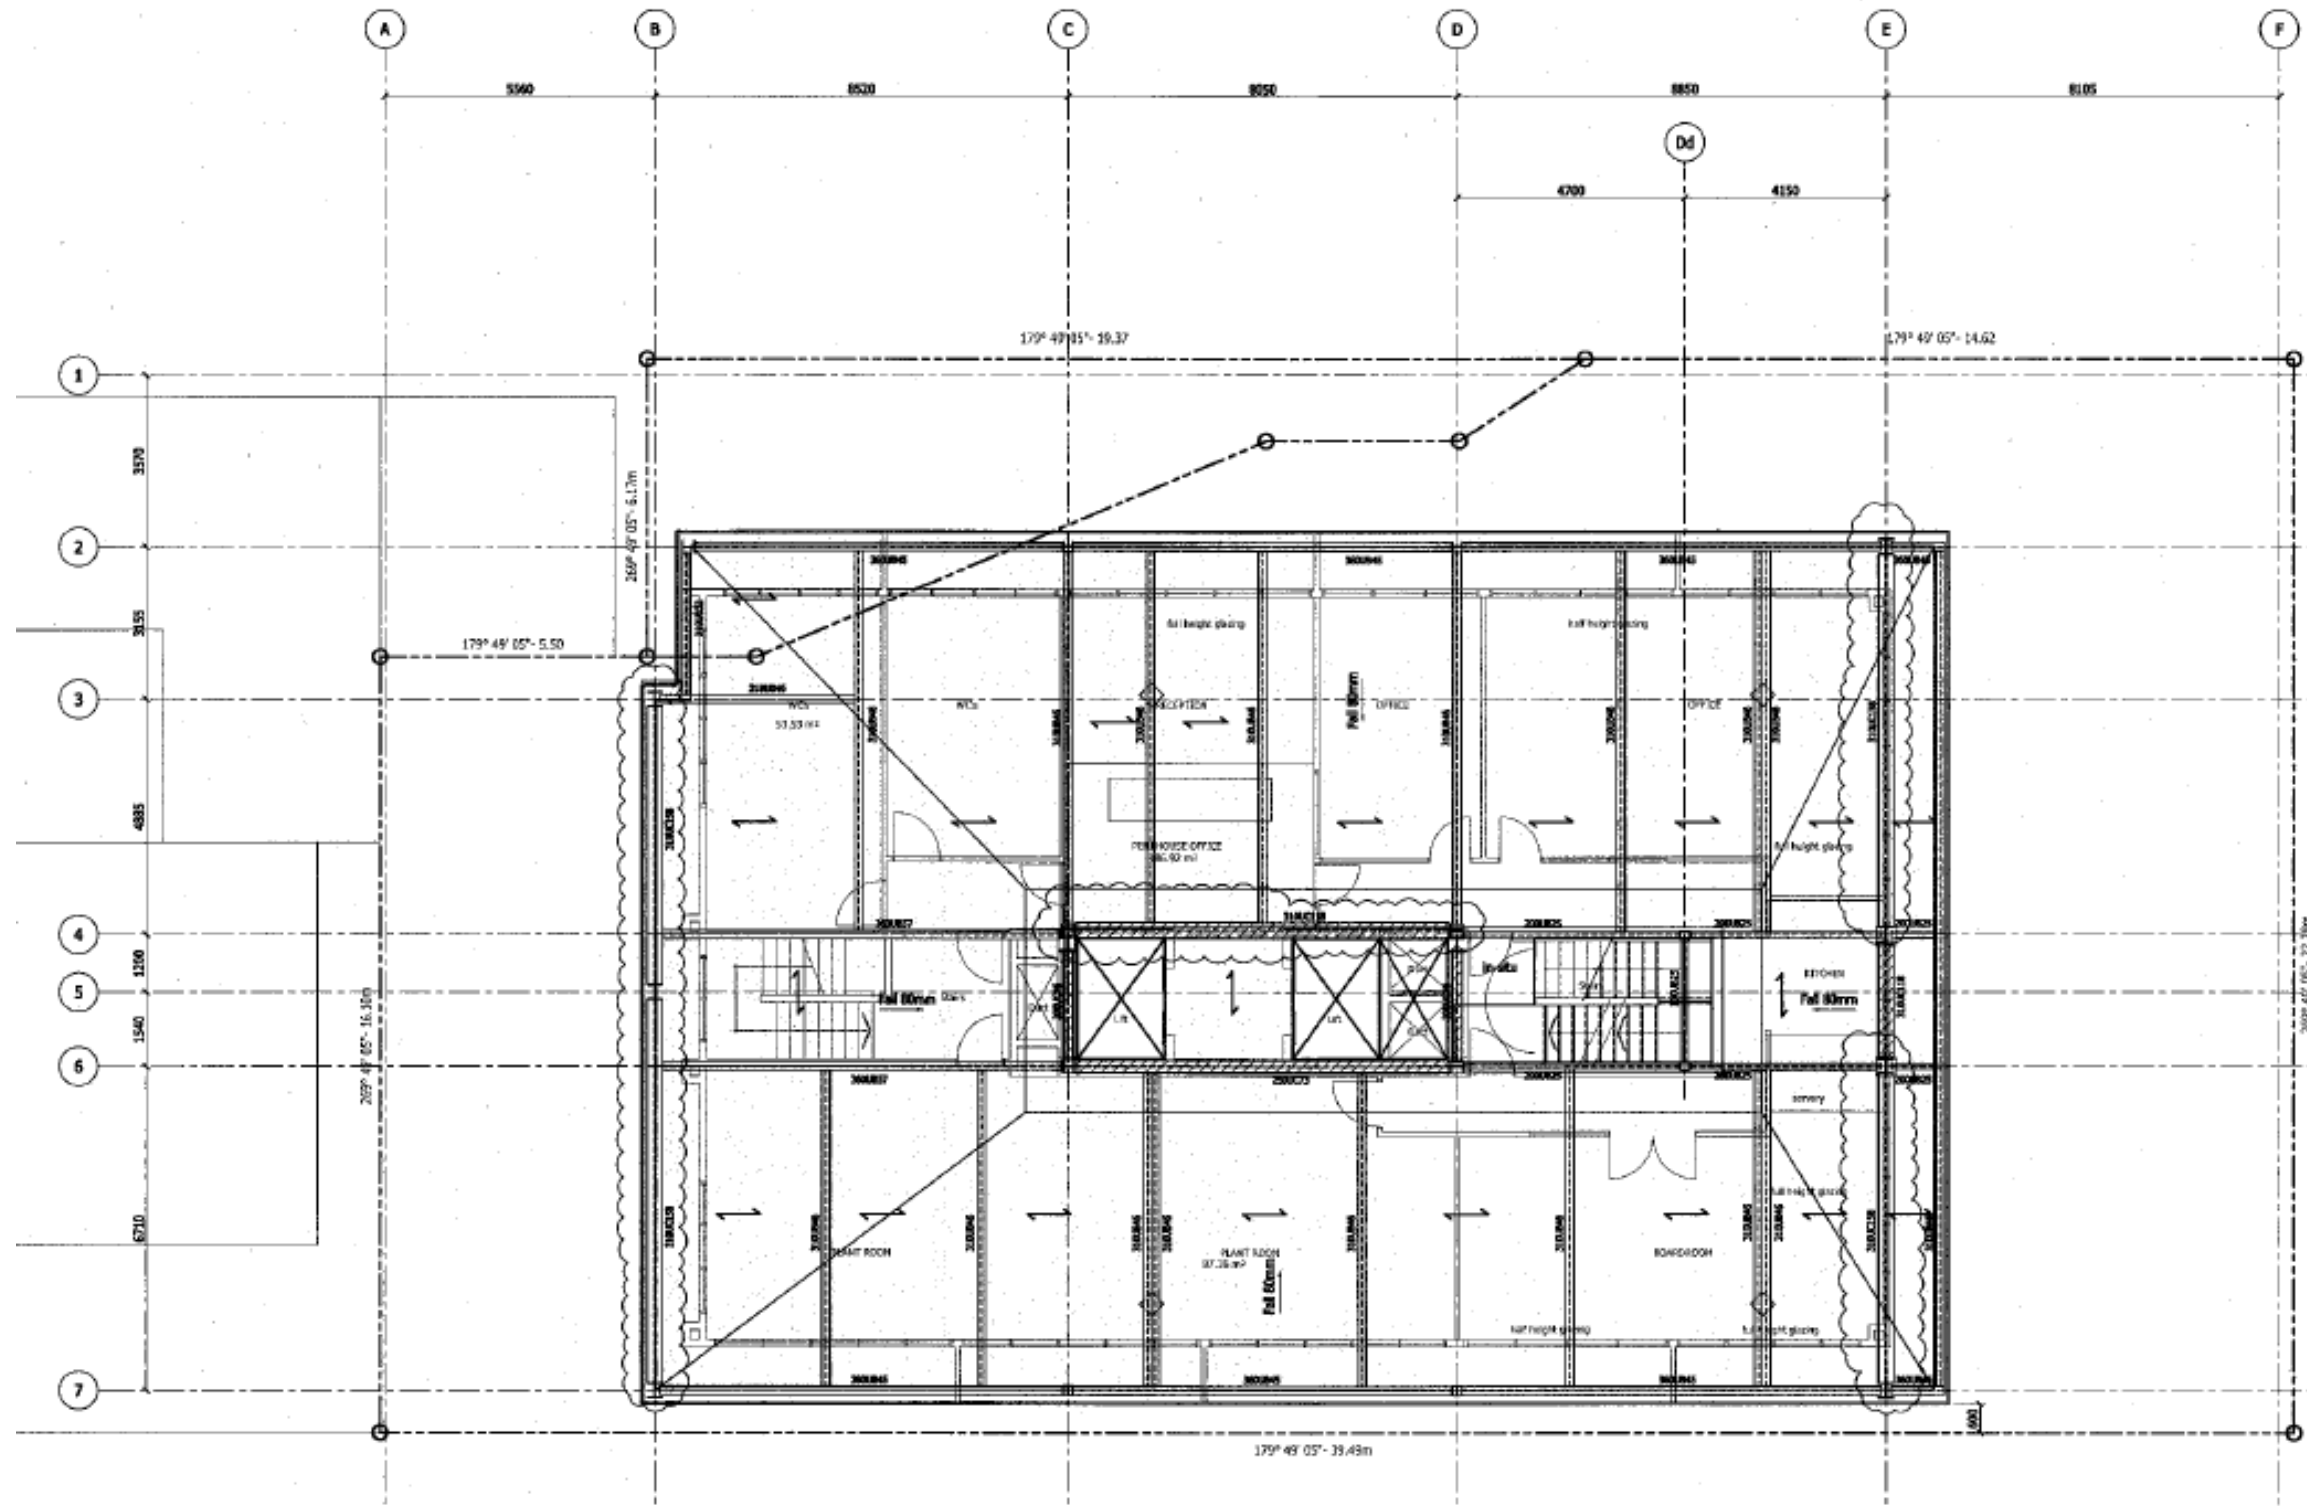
Structural Plan – Rooftop (Christchurch City Council 2016c)
